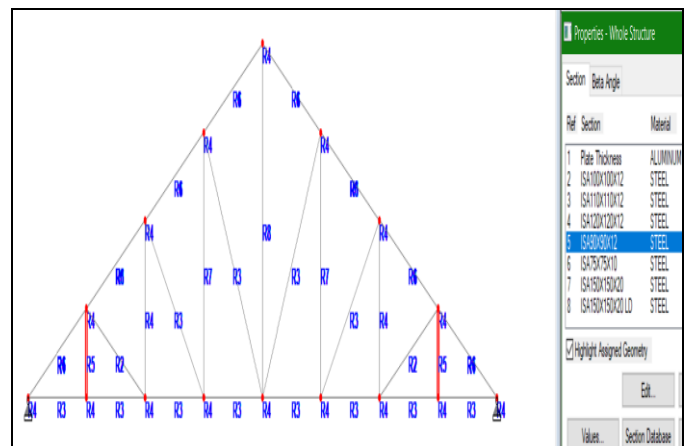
Property of Steel ISA 90 X 90 X 12 mm provided for above red colored Member of Steel Truss.
